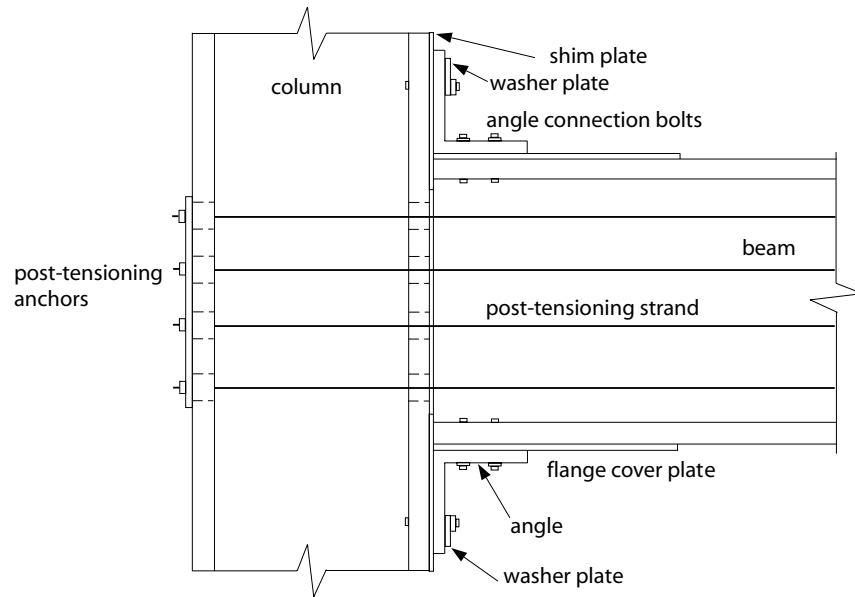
Post-tensioned steel exterior beam-column connection
